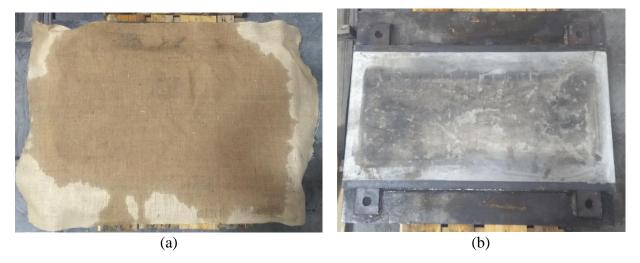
Wet conditioning of concrete surface plate: (a) wet burlap placed on the concrete surface; (b) concrete surface after saturation
